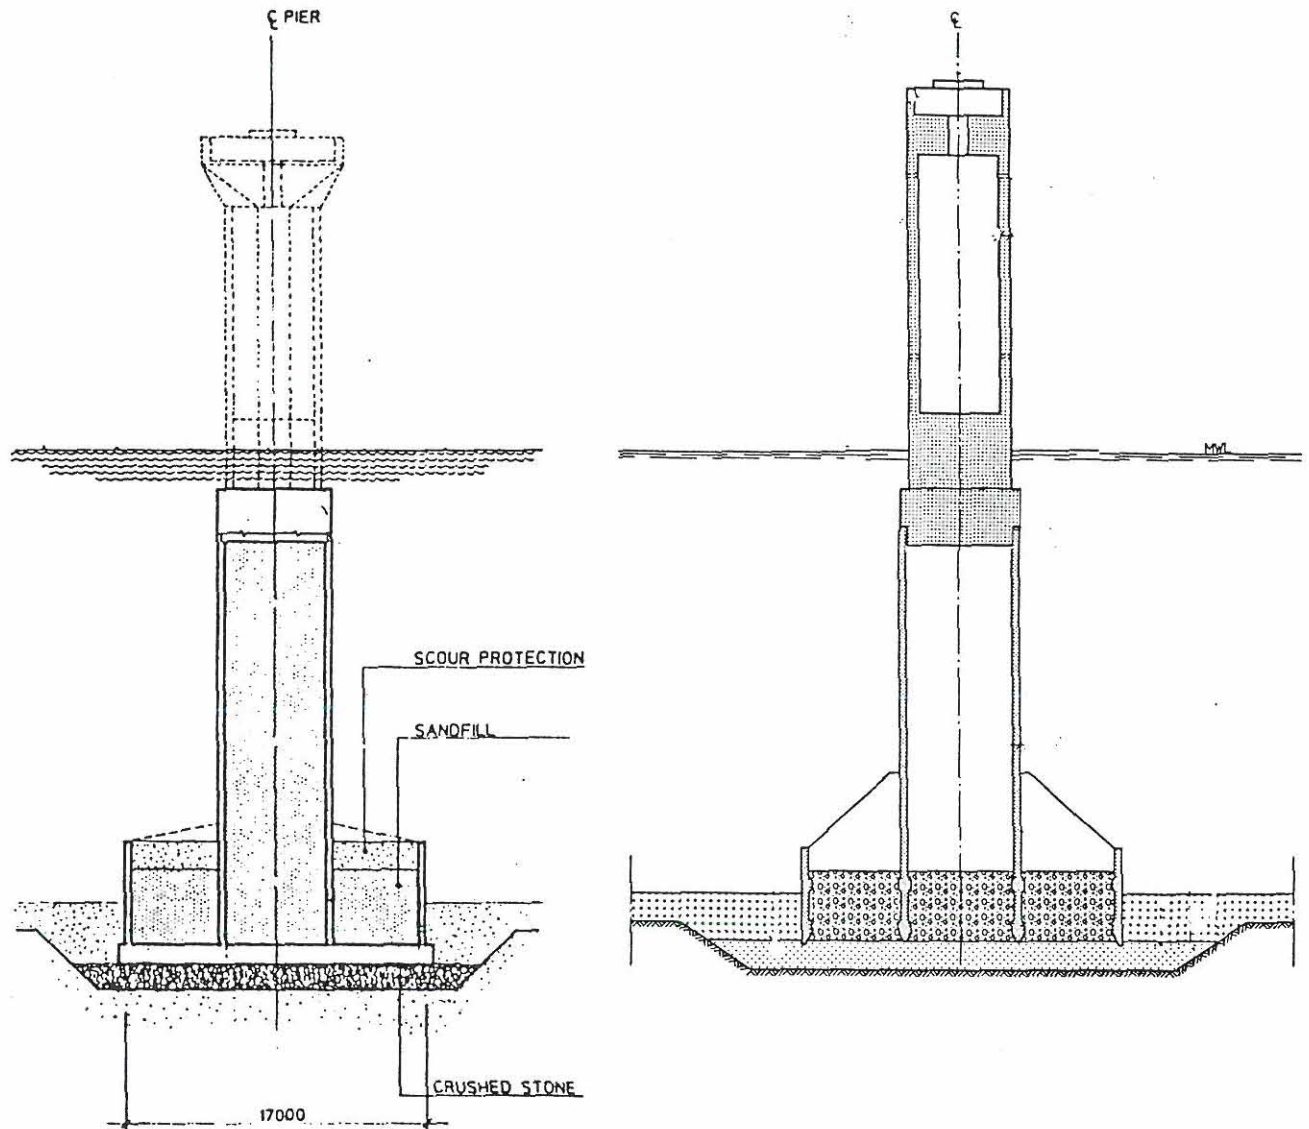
Caisson with plane base plate and open caisson with in-situ casting of tremie concrete
